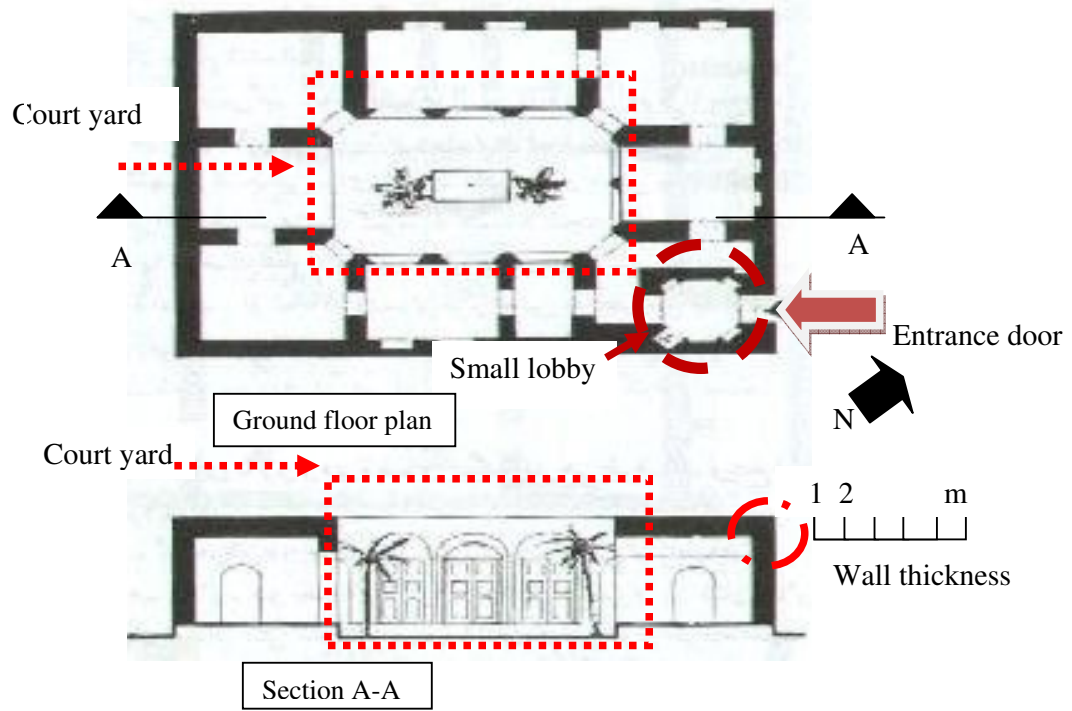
Ground floor plan and section of vernacular house in Yazd (Memarian.GH, 2006)
